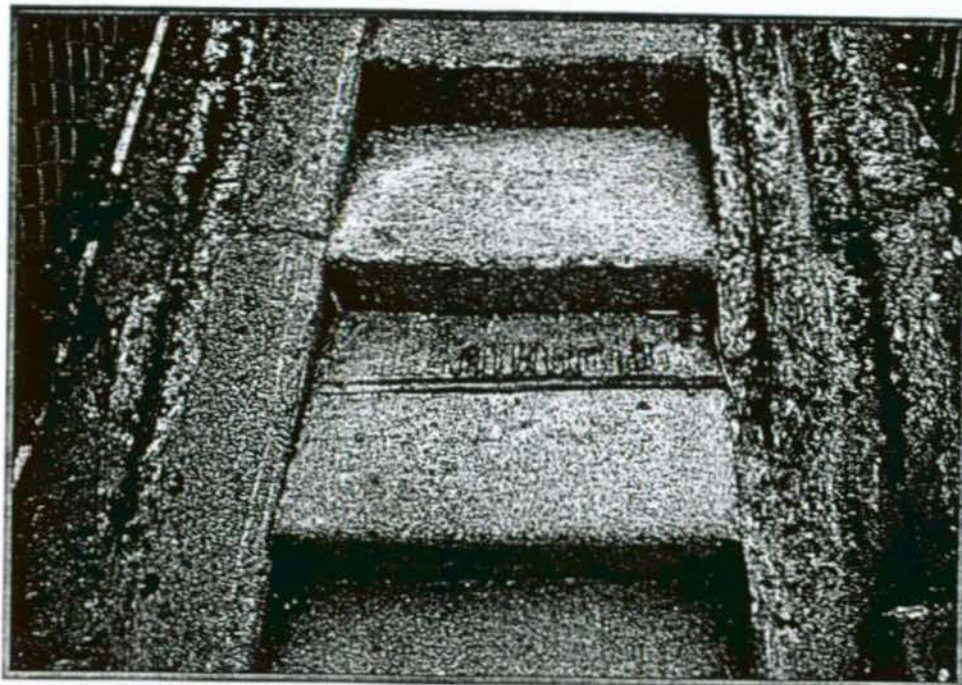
A filled trench drain, missing curb sections on both sides of the stairway, a horizontal cold joint, and exposed reinforcing bars.
